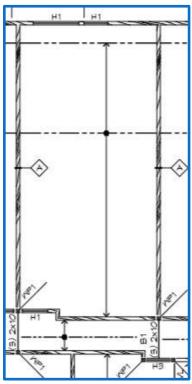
Excerpt From Level 3-6 Structural Plan (KSS)
